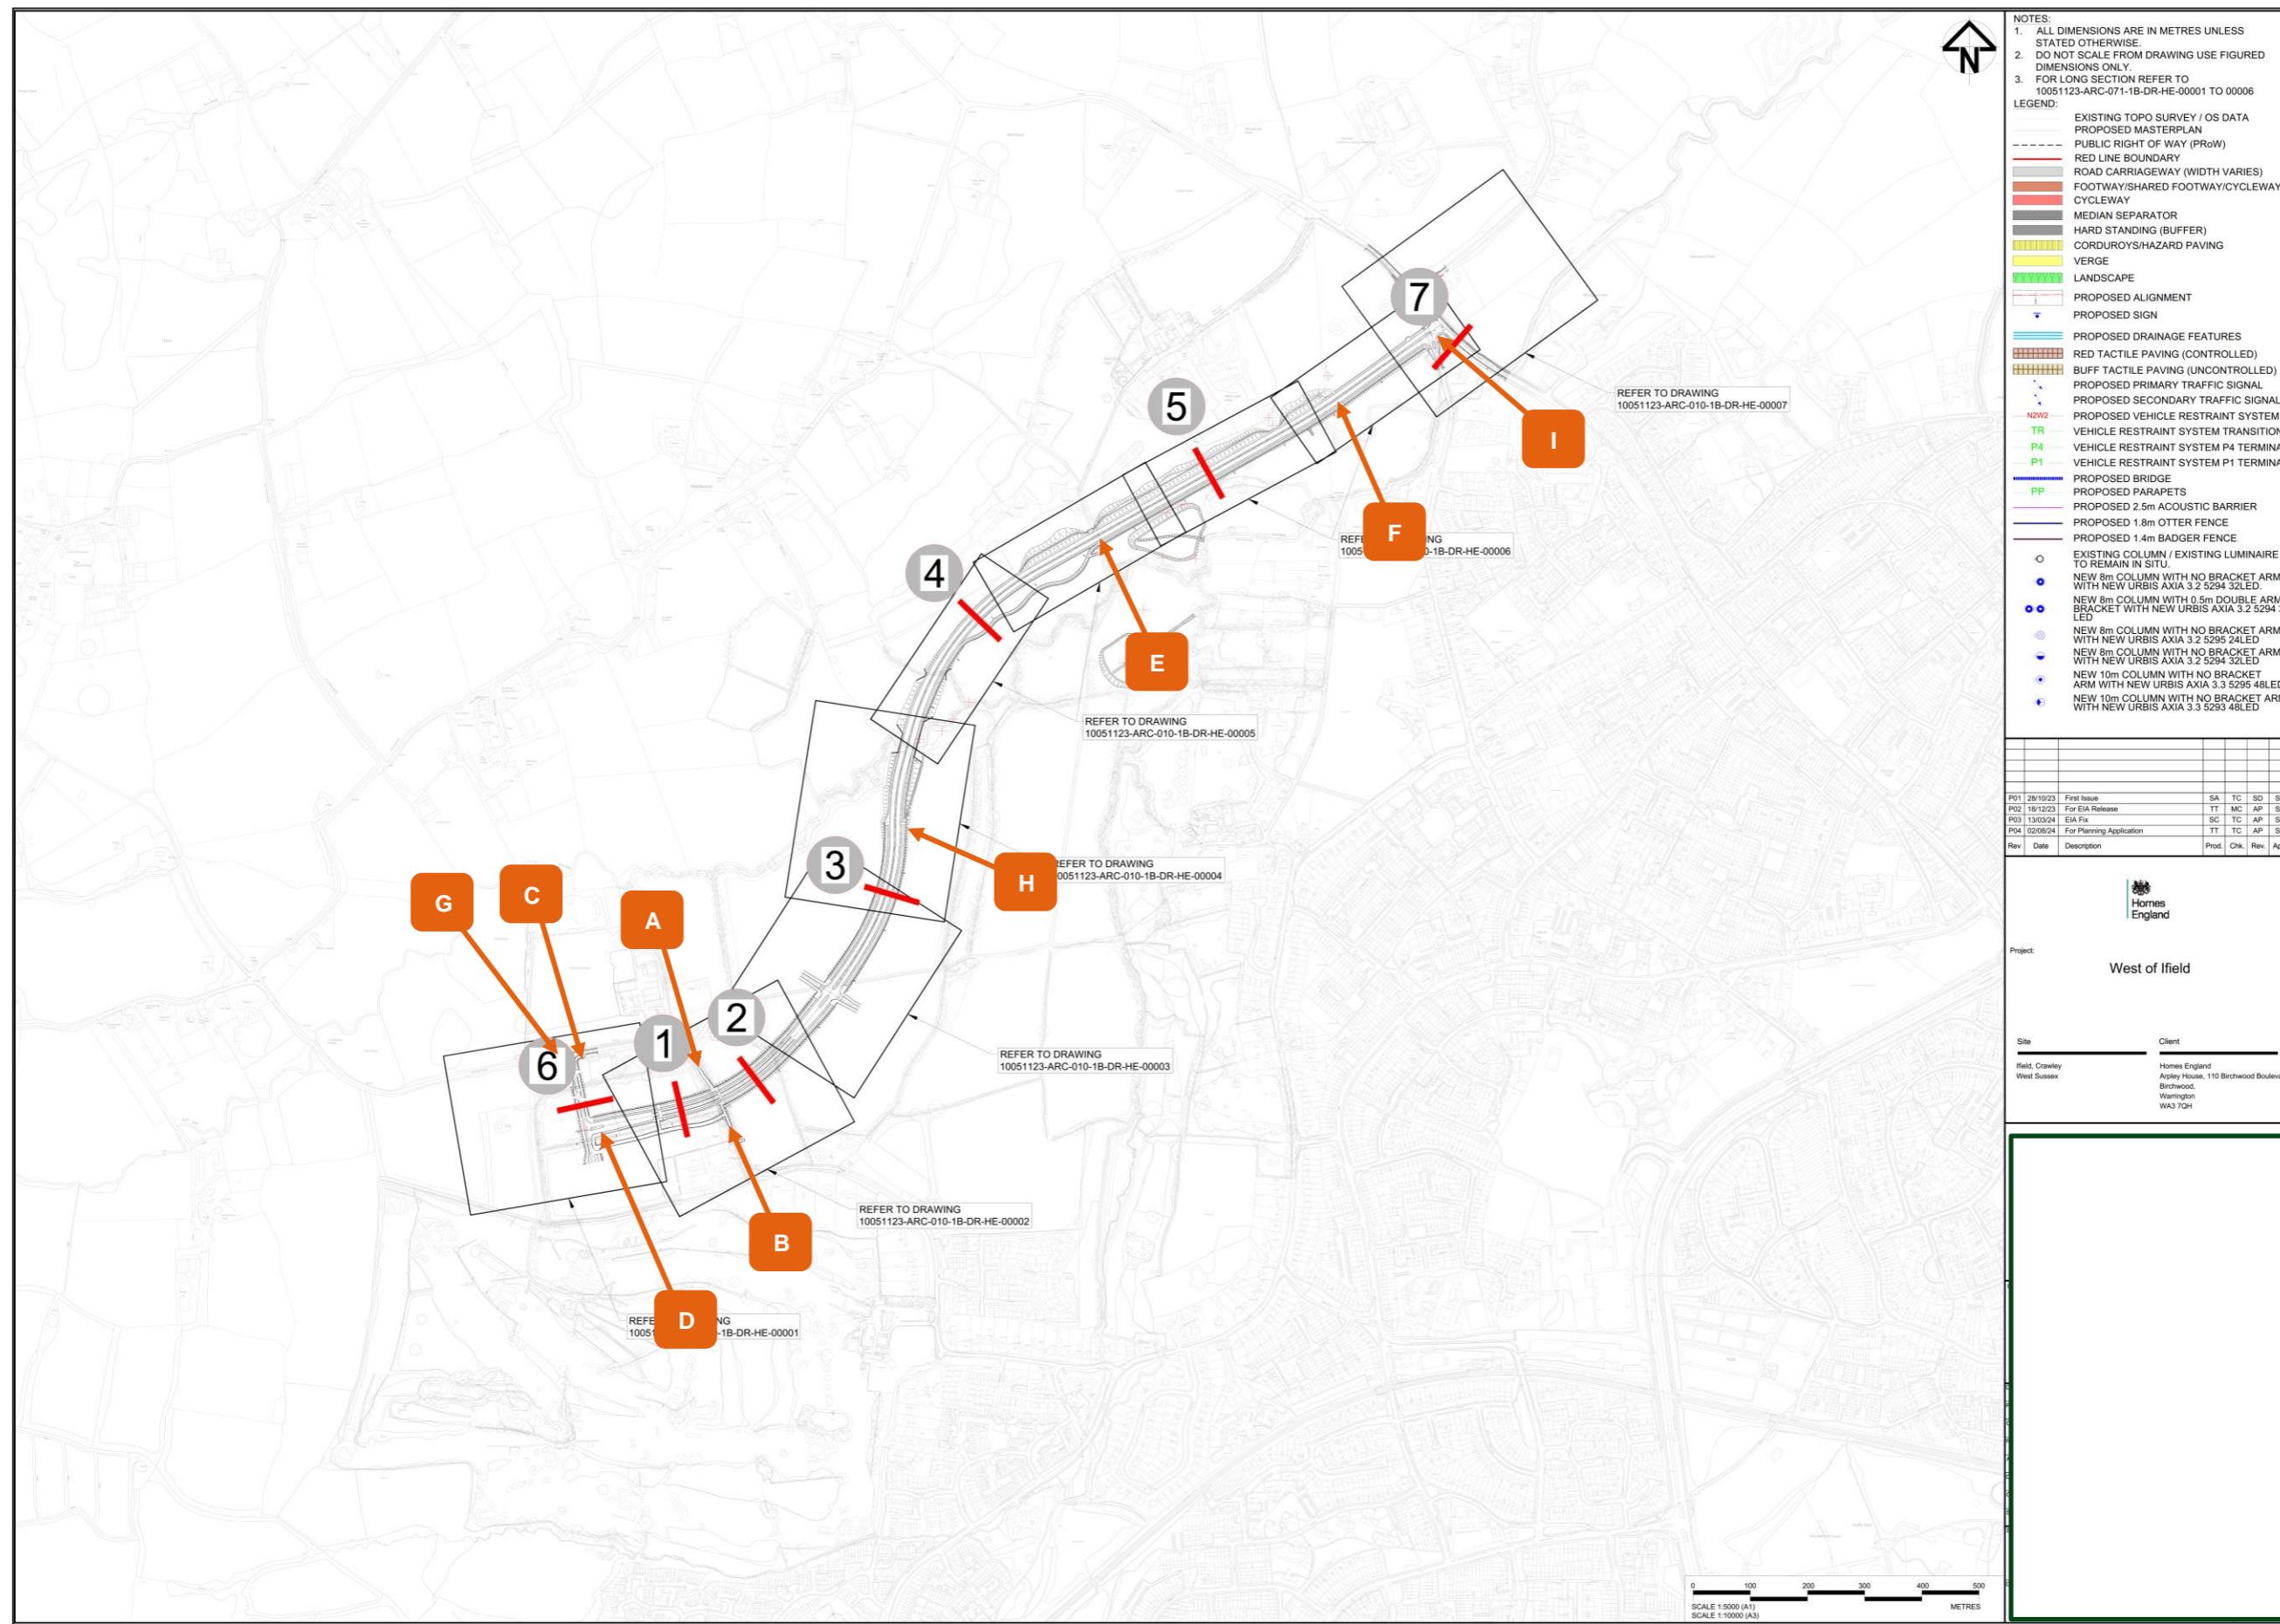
Extract of drawing 10051123-ARC-050-1A-DR-CE-00001 Rev P04
